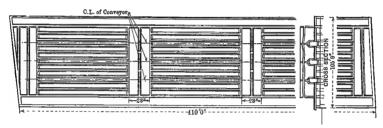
Foundation plan of cement stock-house, Hudson Portland Cement Co.
